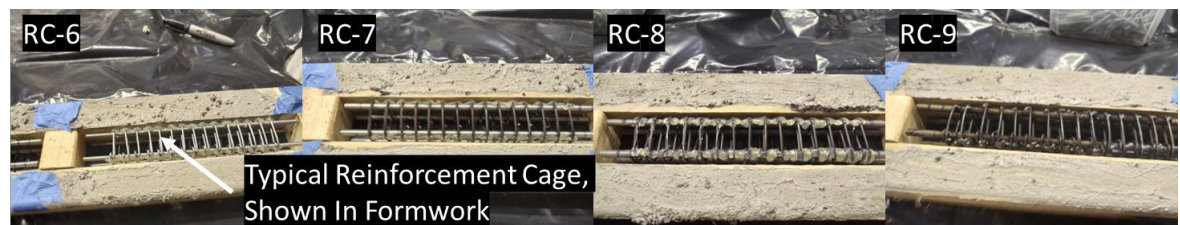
Beams RC-6 through RC-9 are shown before casting. Beam RC-9, the only beam tested with welded fixture of the shear reinforcement, is the most significant sample tested to date.
